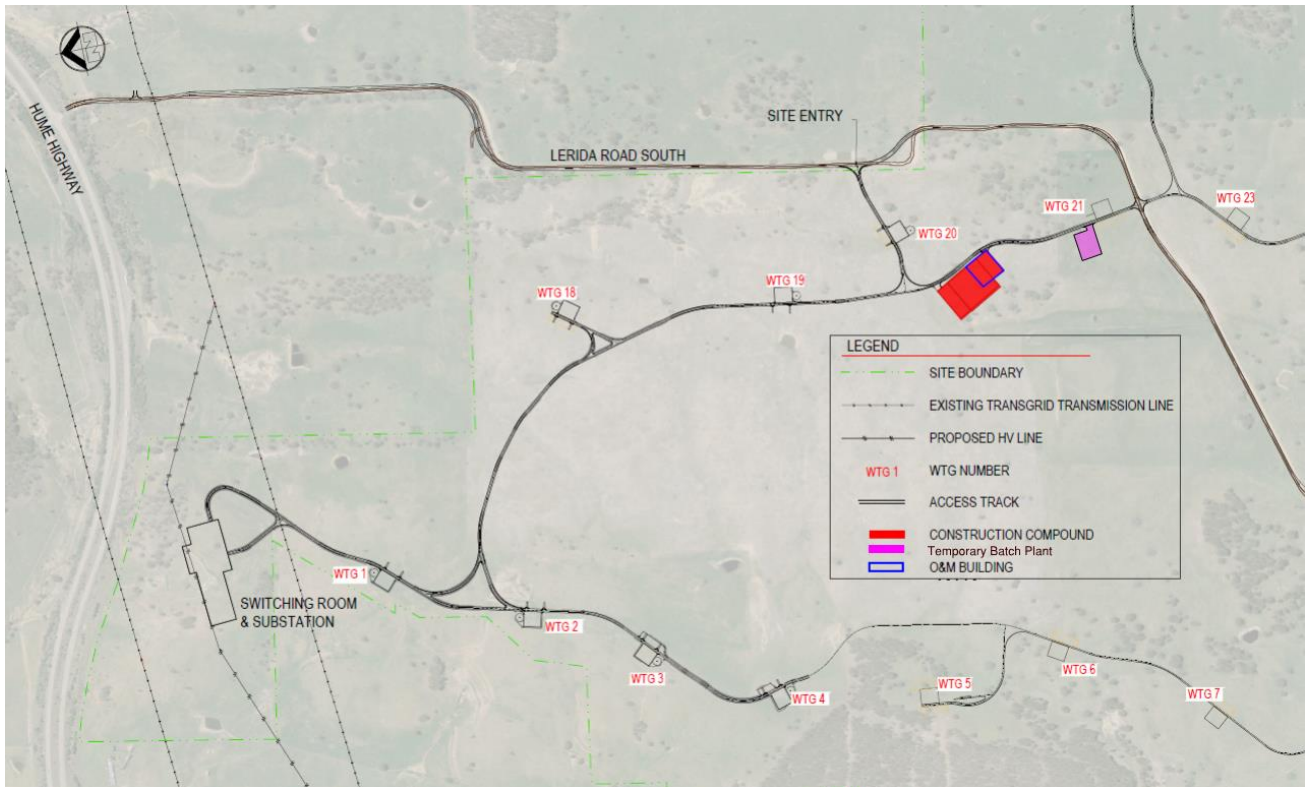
Construction Compound & Temporary Concrete Batch Plant and Site Access Location
